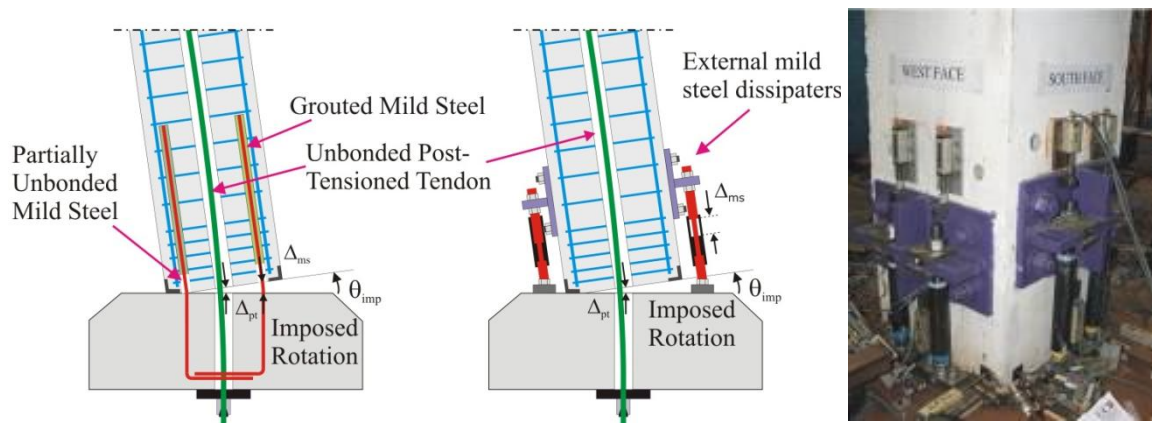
Internal versus external replaceable dissipaters at the base connections (after Marriott et al. 2008a).
